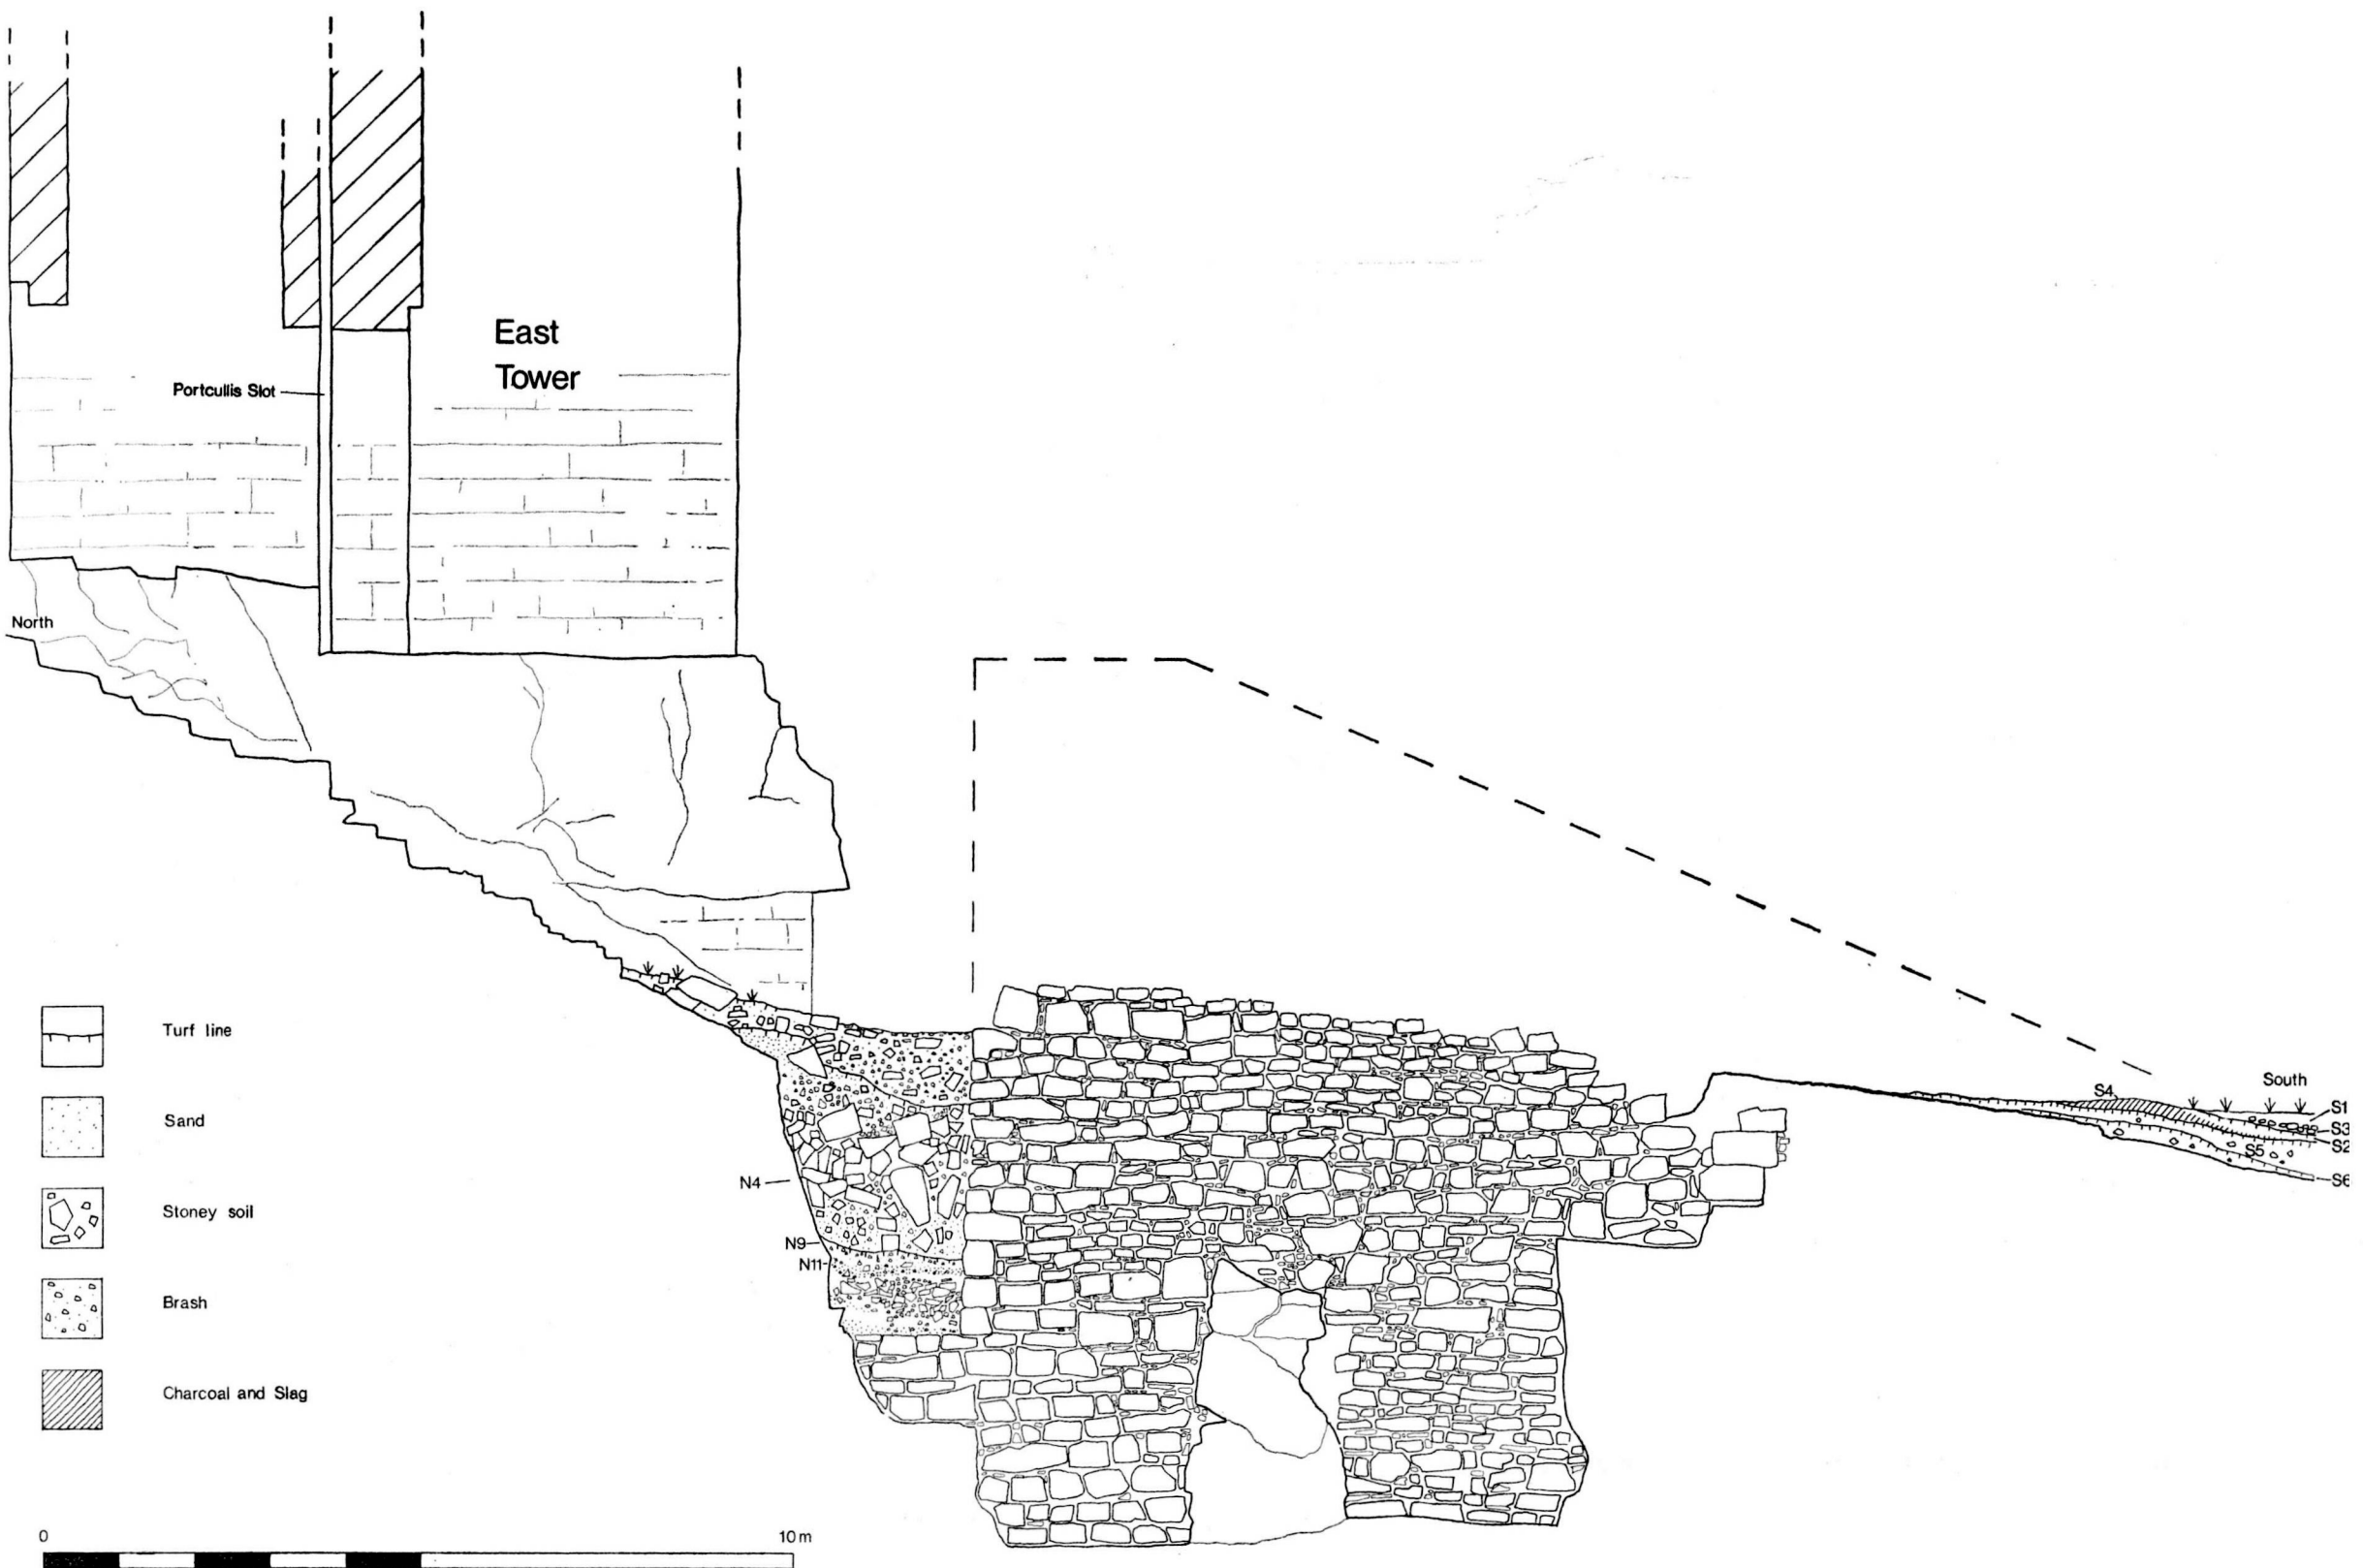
Western elevation of causeway wall, drawbridge gap and gatehouse, with suggested profile of original causeway
